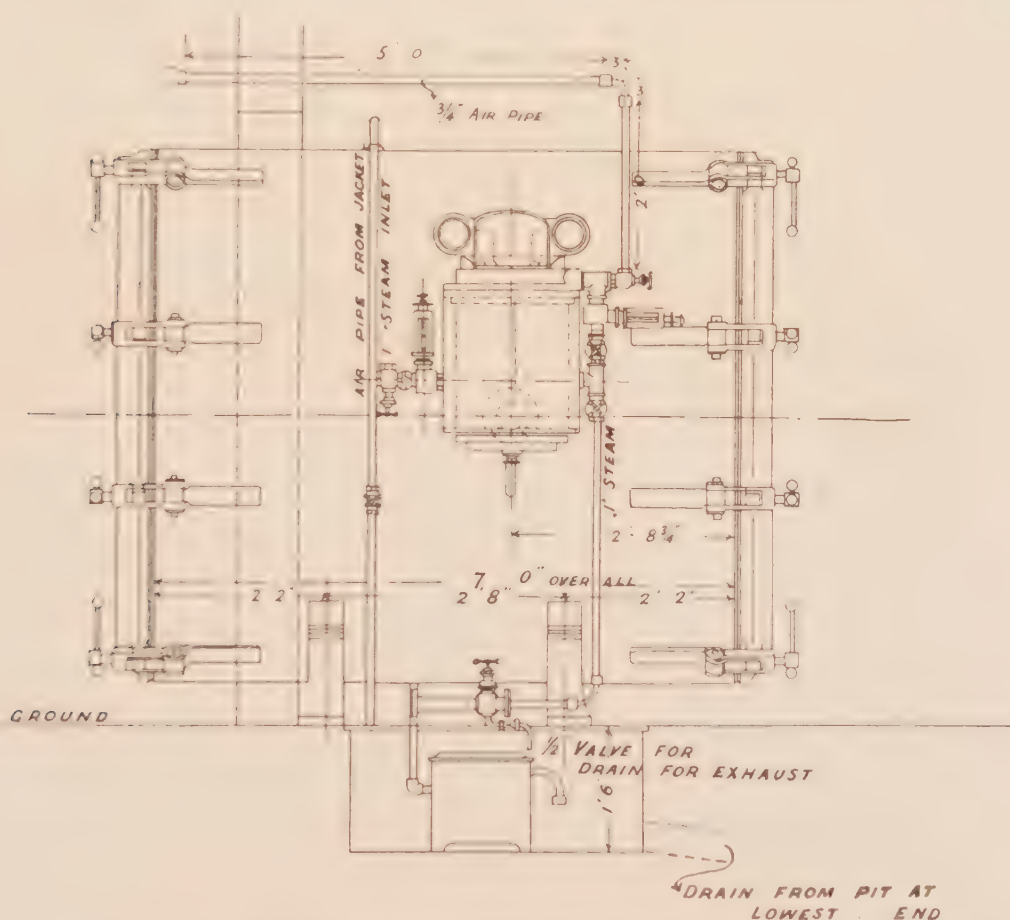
Showing Plan of Disinfecting Machine and arrangement of Steam Pipes.
